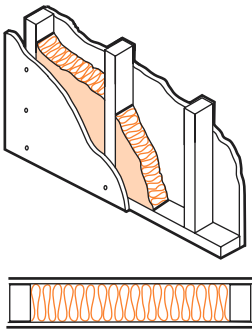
Conventional wood stud construction, single layer gypsum wallboard each side, $3\frac{1}{2}$ " thick fiber glass insulation in wall cavity. STC: 39.
